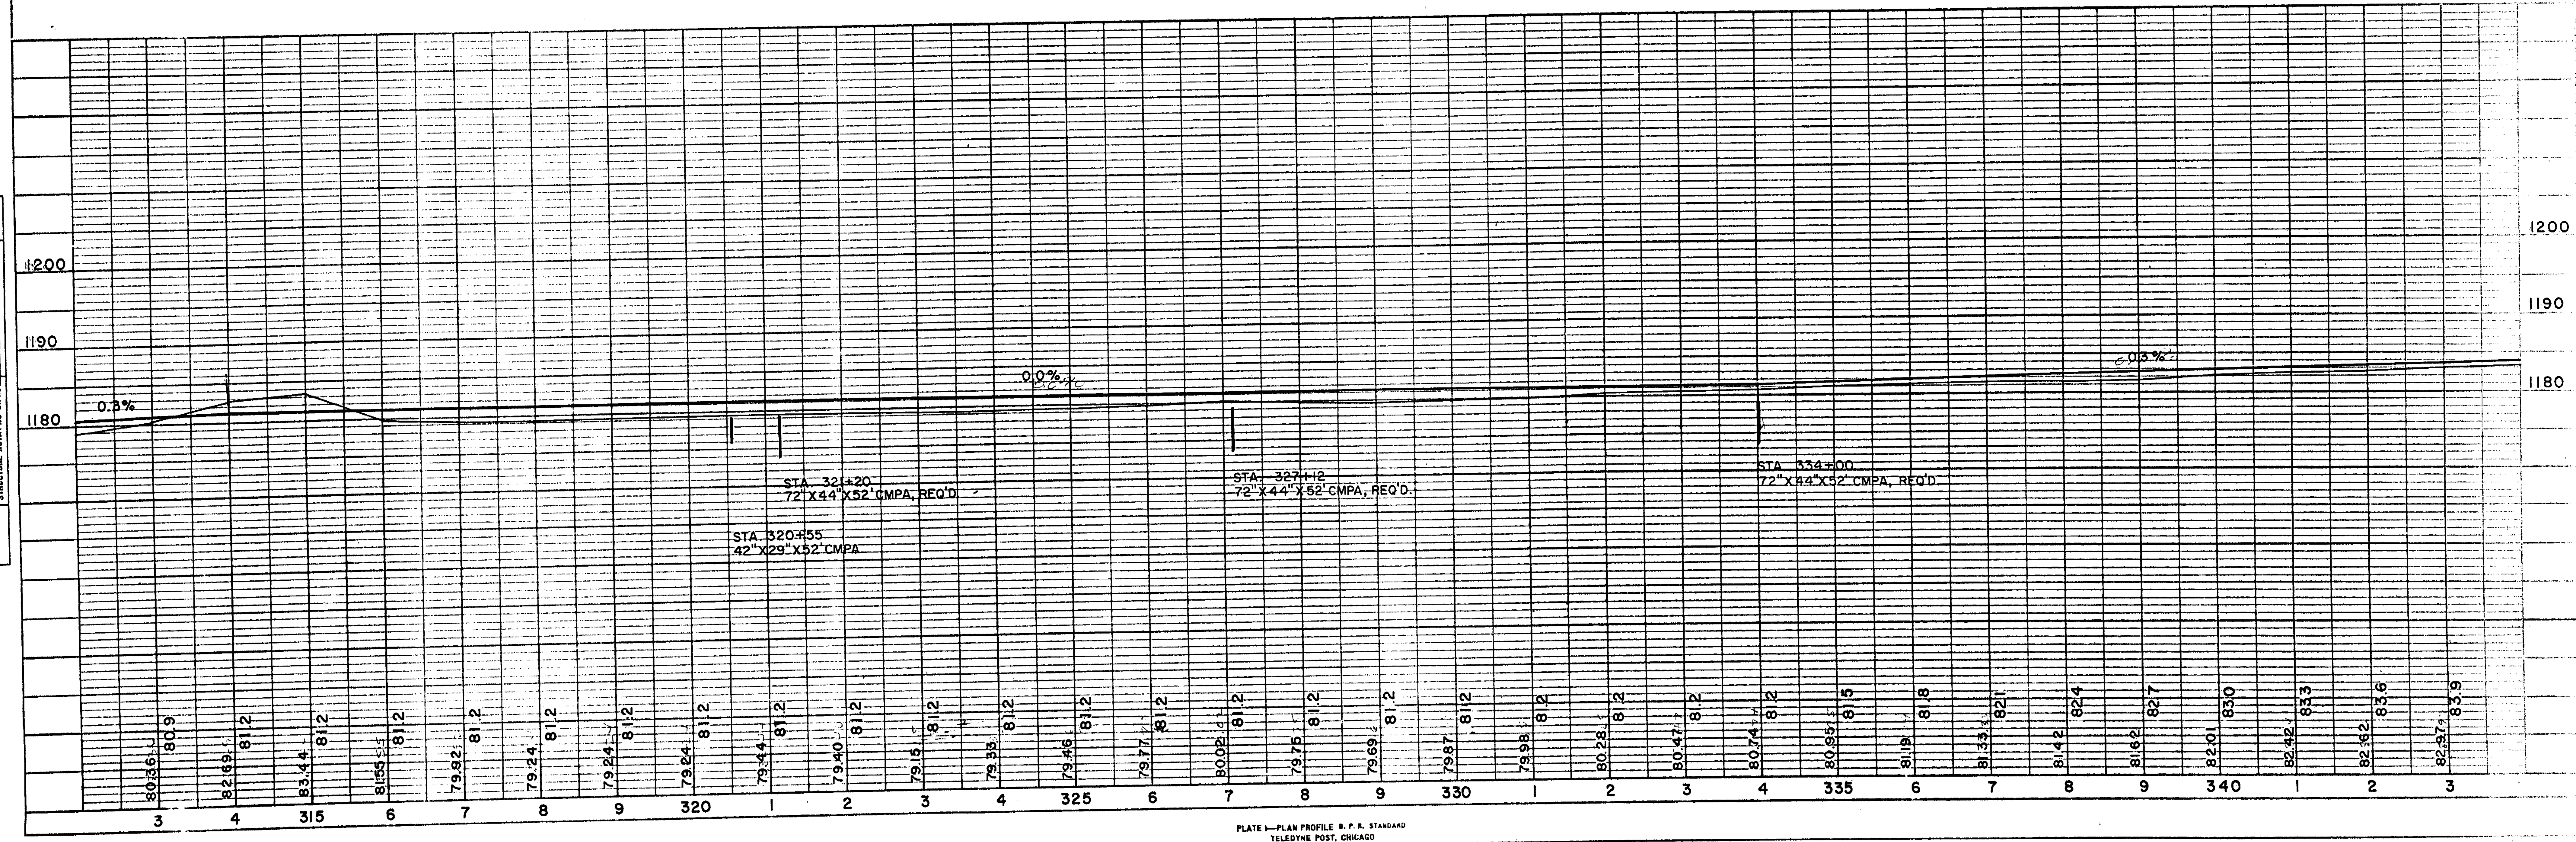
PLAN PROFILE B. P. R. STANDAARD
